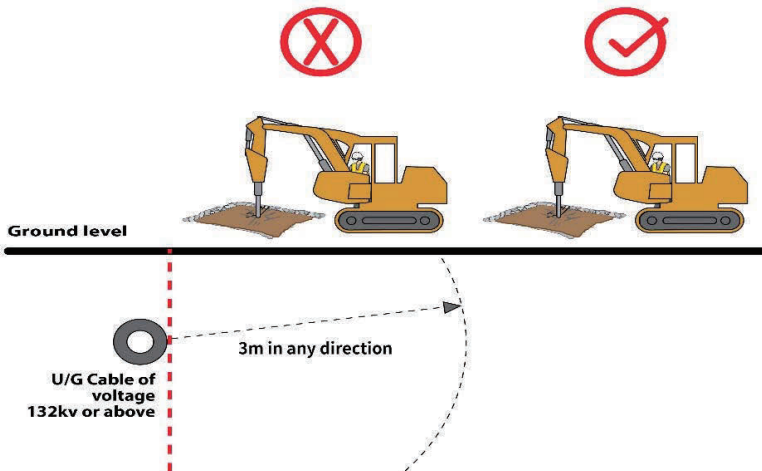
Minimum safe working distance between U/G cables of voltage 132kV or above and the point where mechanical excavators are used
